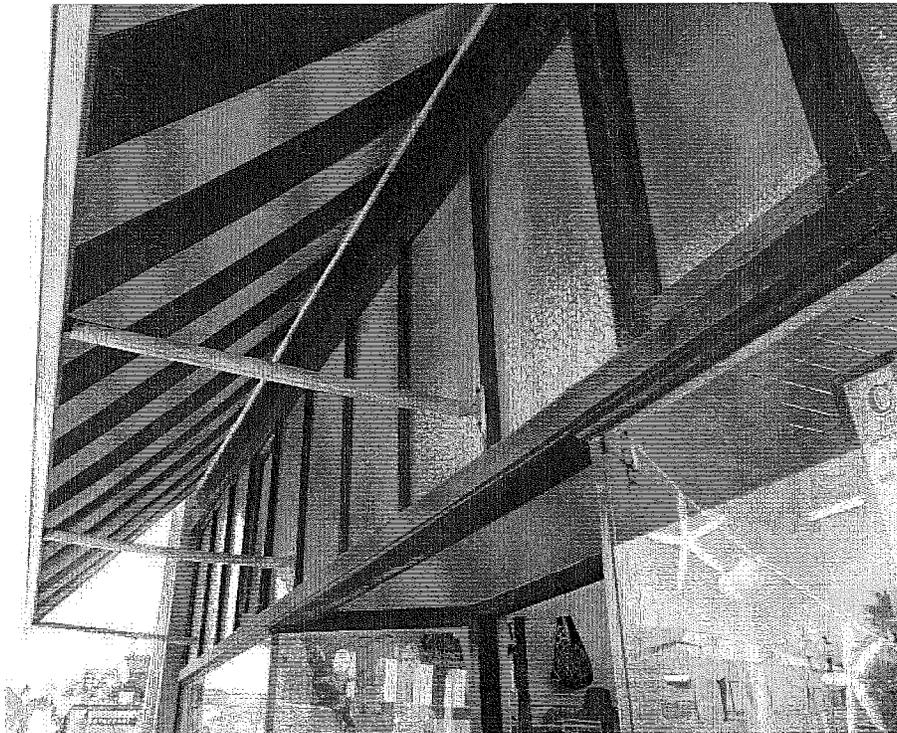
124 Main Street, Detail of transom windows above storefront, primary (north) elevation, view to east (PCR 2012)
